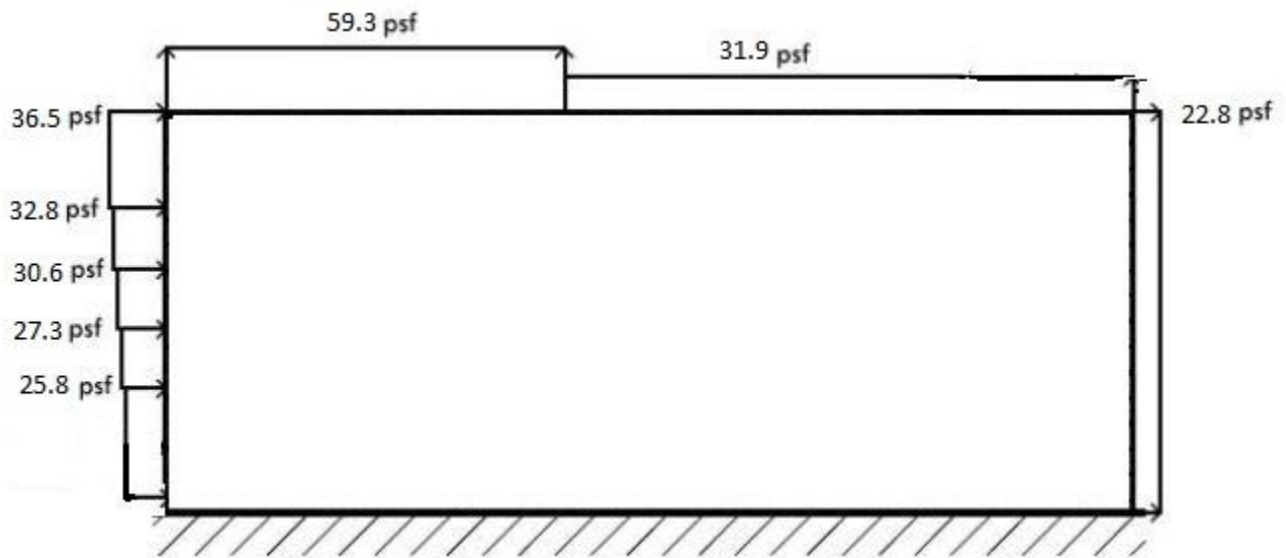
Wind Pressures acting on the East Wing, North and South facades
